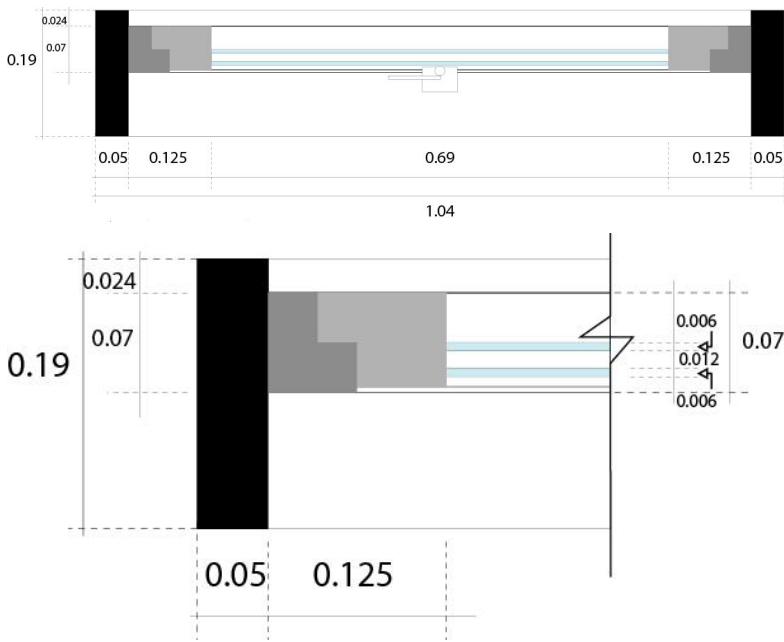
Section of the double-glazing opening window (unit: m)
